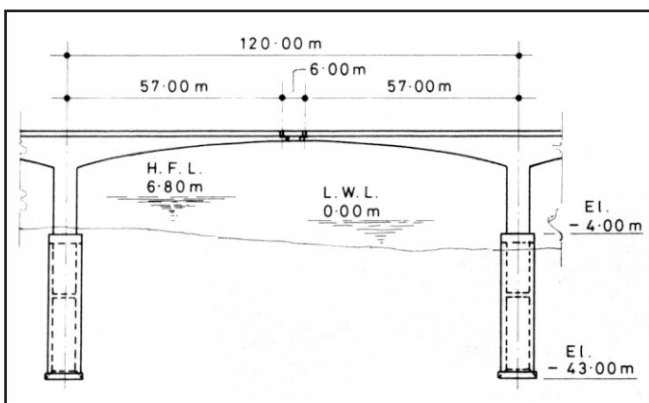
The Kalyani Bridge, West Bengal, with span ranging from 35m to 120m. The 120-m spans consist of two prestressed concrete cantilevers of 57m each and a 6-m suspended span in reinforced concrete
